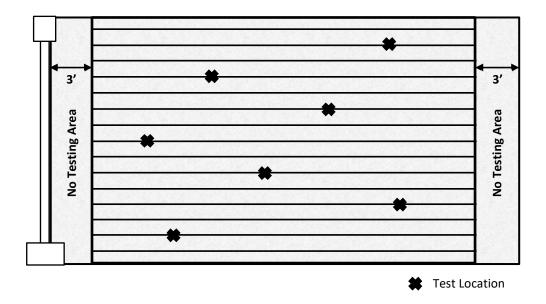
Testing Frequencies and Locations for MSE Walls (less than 100')
